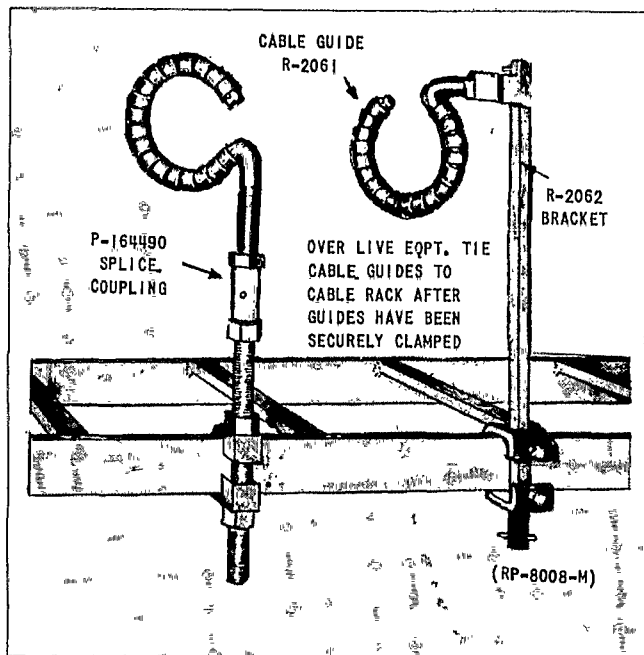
METHOD OF MOUNTING CABLE GUIDES, R-2061 (PAR. 10.052)
